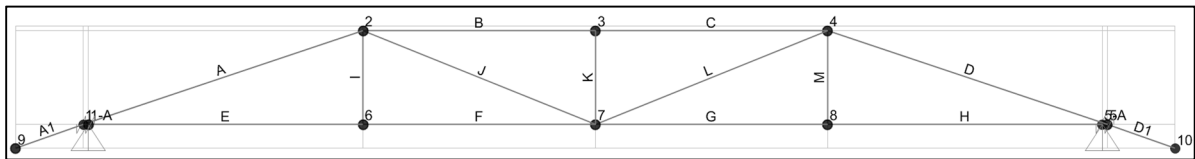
SAP2000 model of Truss A2, with numbered joint labels and lettered member labels
